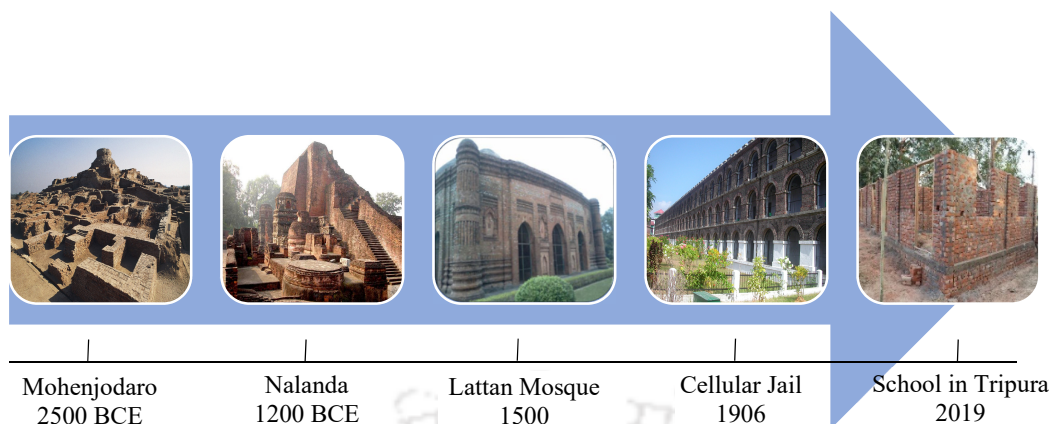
Brick masonry structures since ancient times to existing construction practices.
